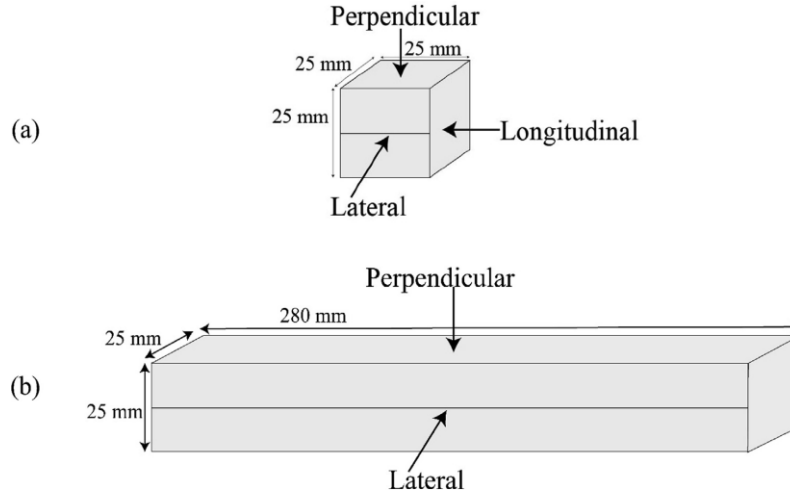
Loading directions of printed specimens; a) compression test; b) flexural test
